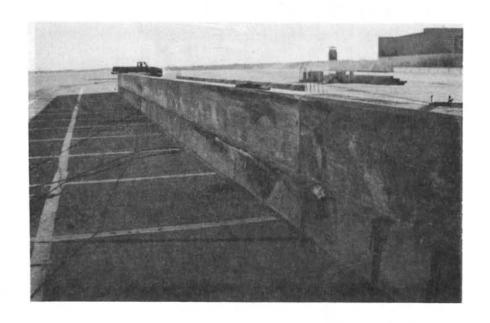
RETROFIT CONCRETE BARRIER RAIL DAMAGE, TEST 12-2
